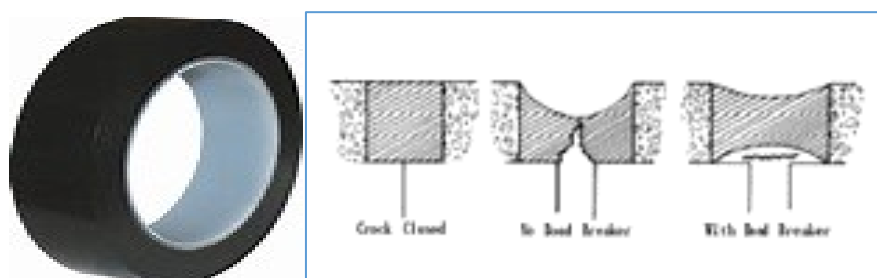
Bond breaker and its effect on concrete crack
